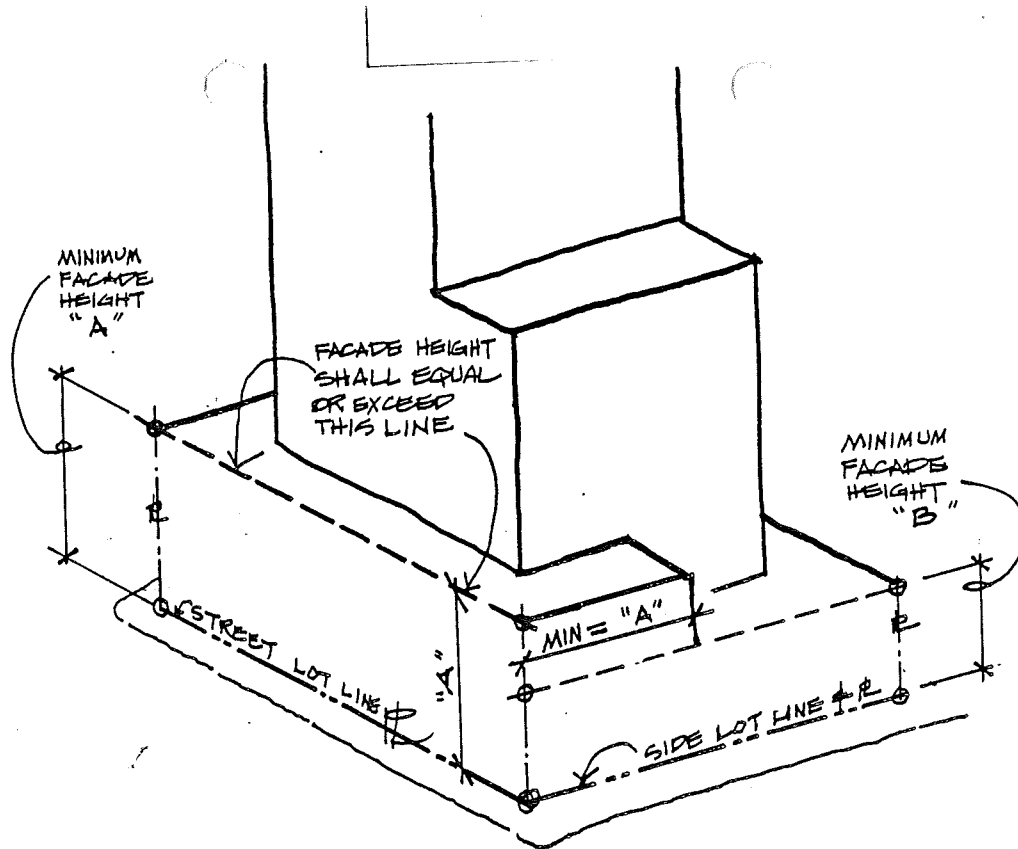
B MINIMUM FACADE HEIGHT AT CORNERS
